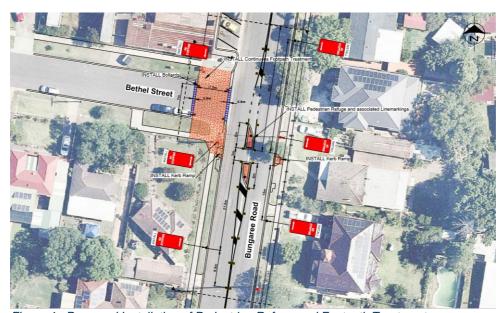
Proposed Installation of Pedestrian Refuge and Footpath Treatment
